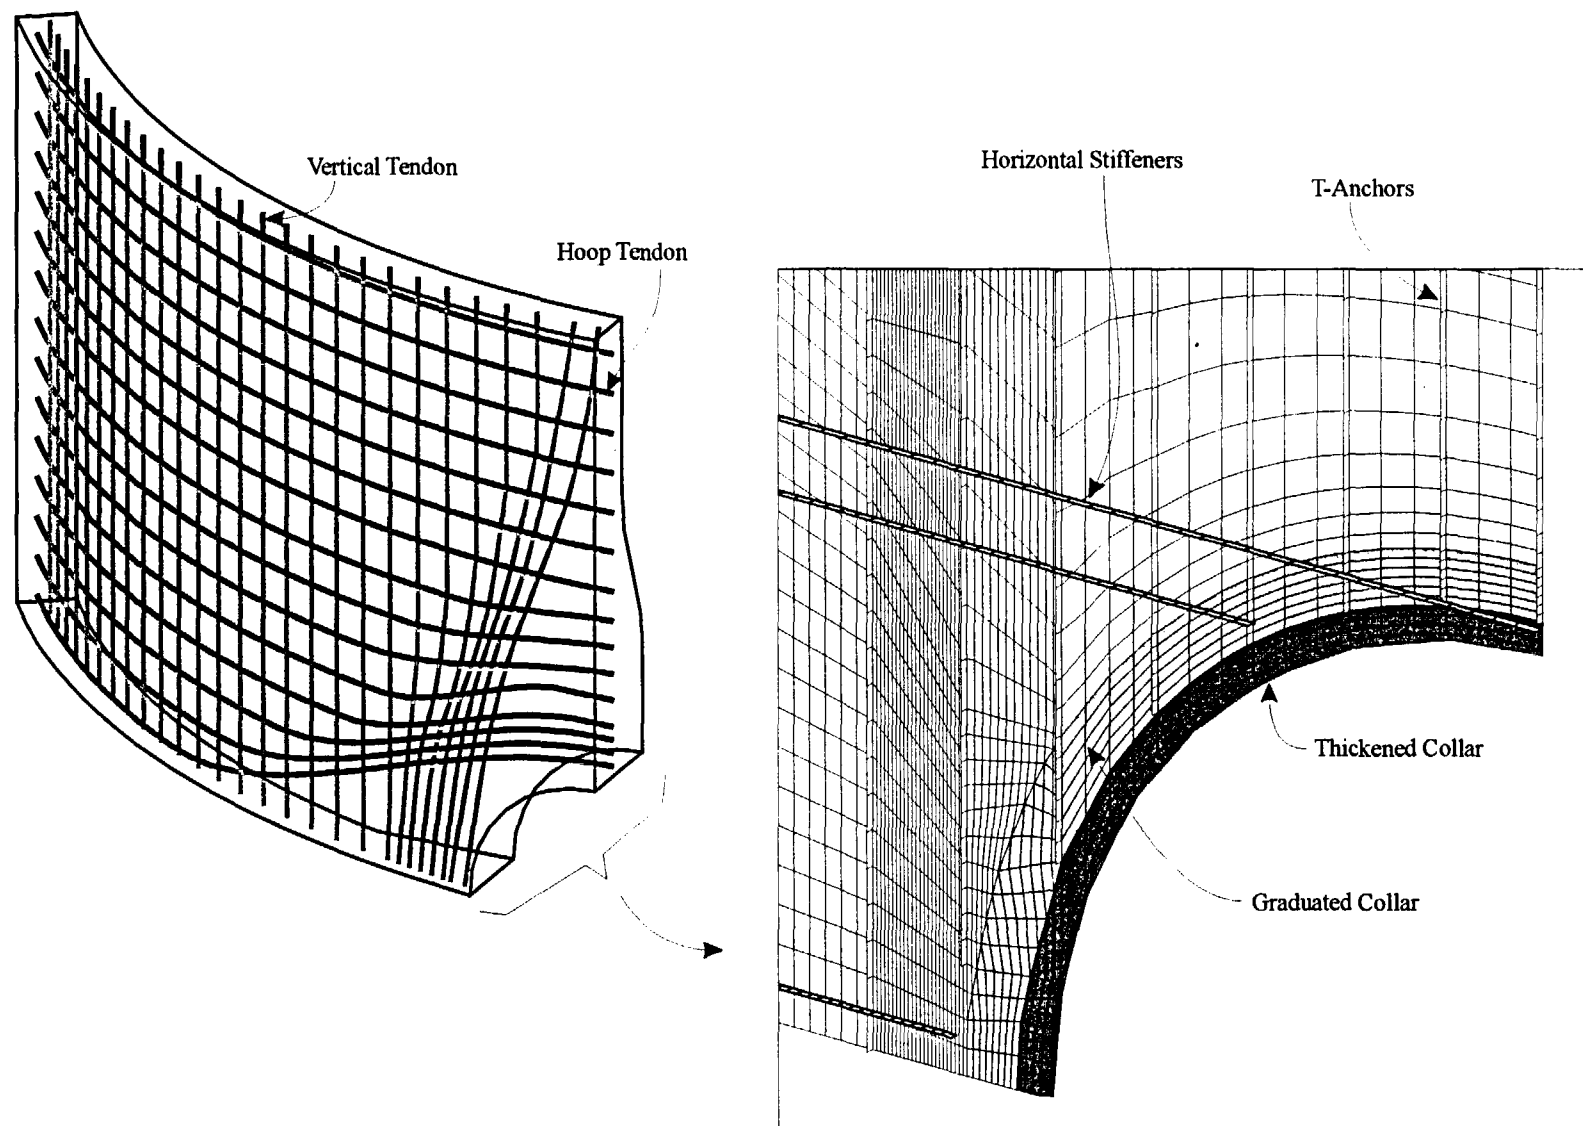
E/H Finite Element Model Including Tendons, Liner, Anchors, and Stiffeners
